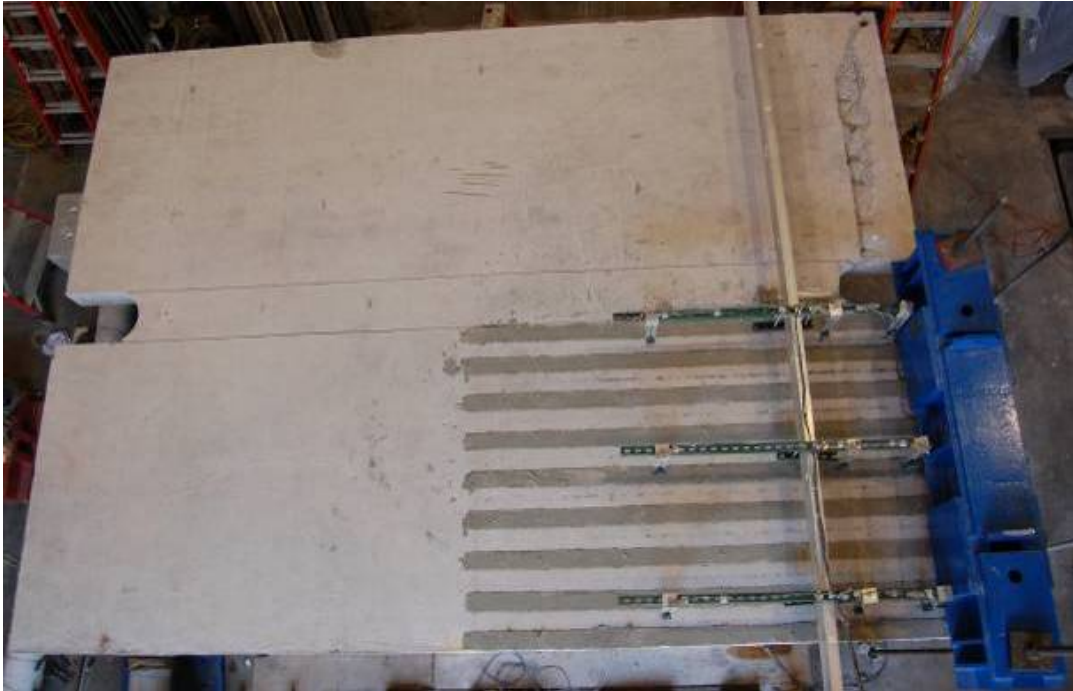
Completed installation of CFRP strips with full instrumentation setup
